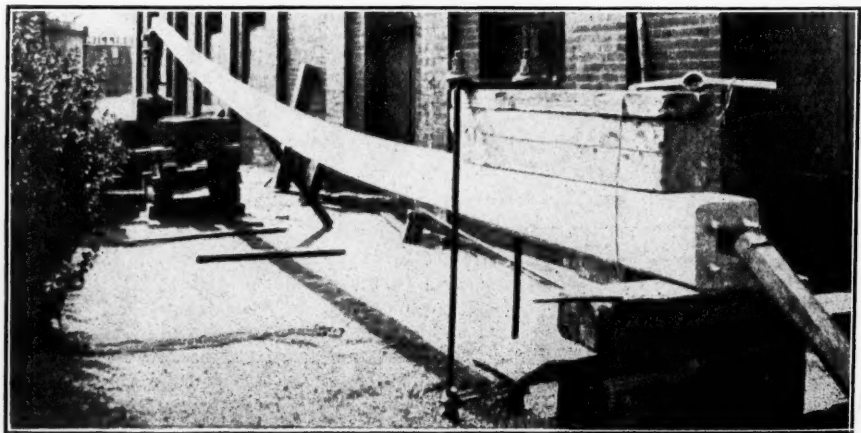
shows the unit with the end or extension straight; this will make a band instead of a center or can be used to alter the shape in forms.
